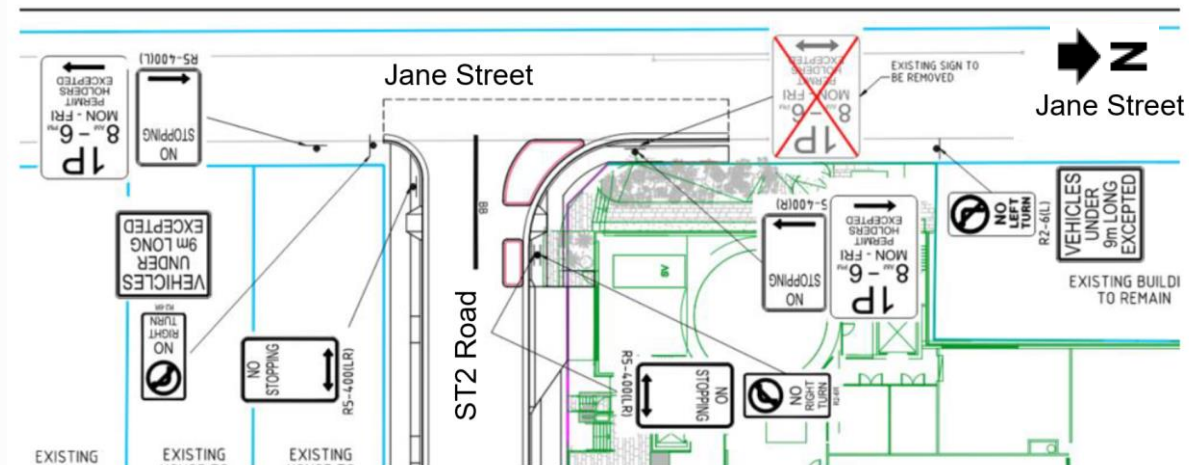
Proposed signs and lines at the intersection of Jane Street and ST2 Road
